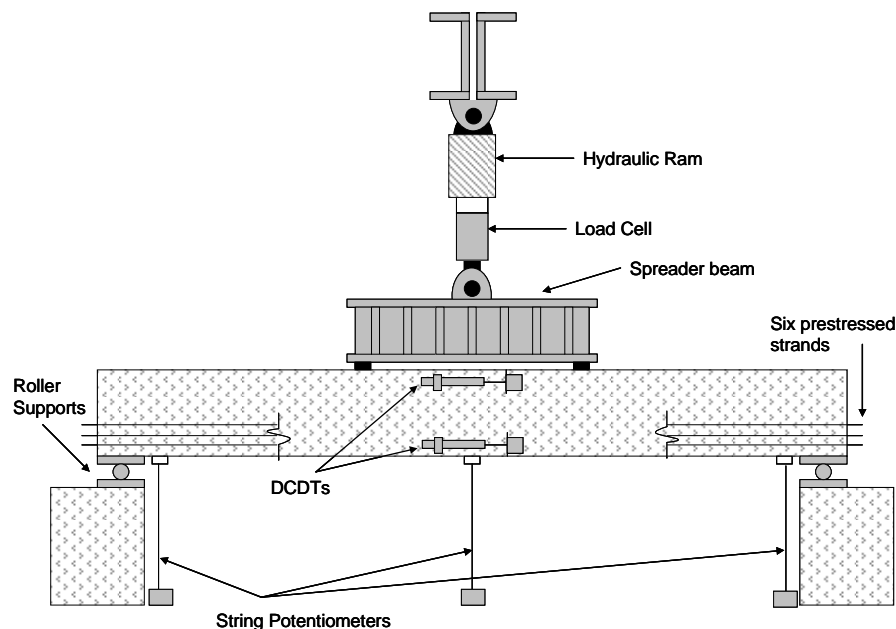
Test setup for static testing of small-scale girders (Type R1)
